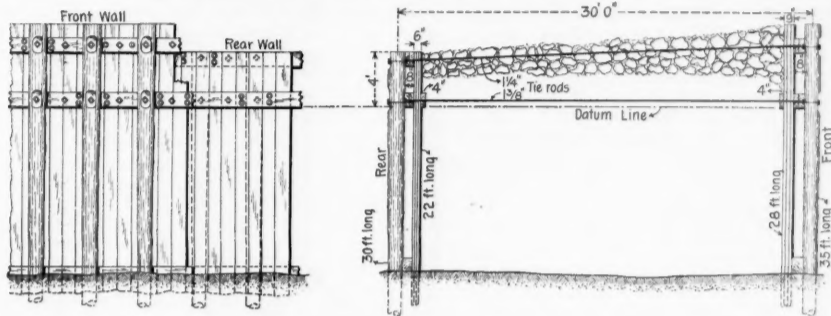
Elevation and Cross-Section of Bulkhead.
